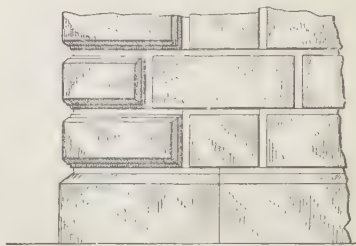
Ashlar Walling with rebated Joints and Moulded Quoins.
